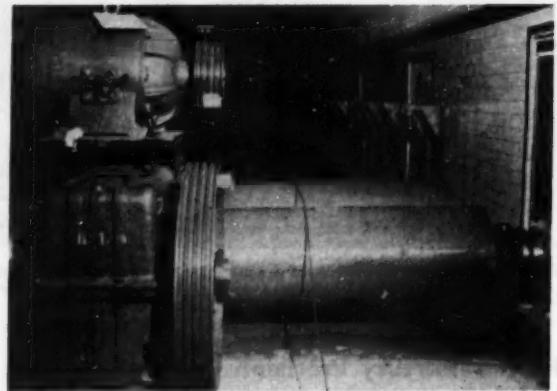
The 460-ft belt has been threaded around head pulley. A 20-hp motor drives the endless rubber and fabric belt 120 fpm. Frames at the right await the handrail balustrade.
